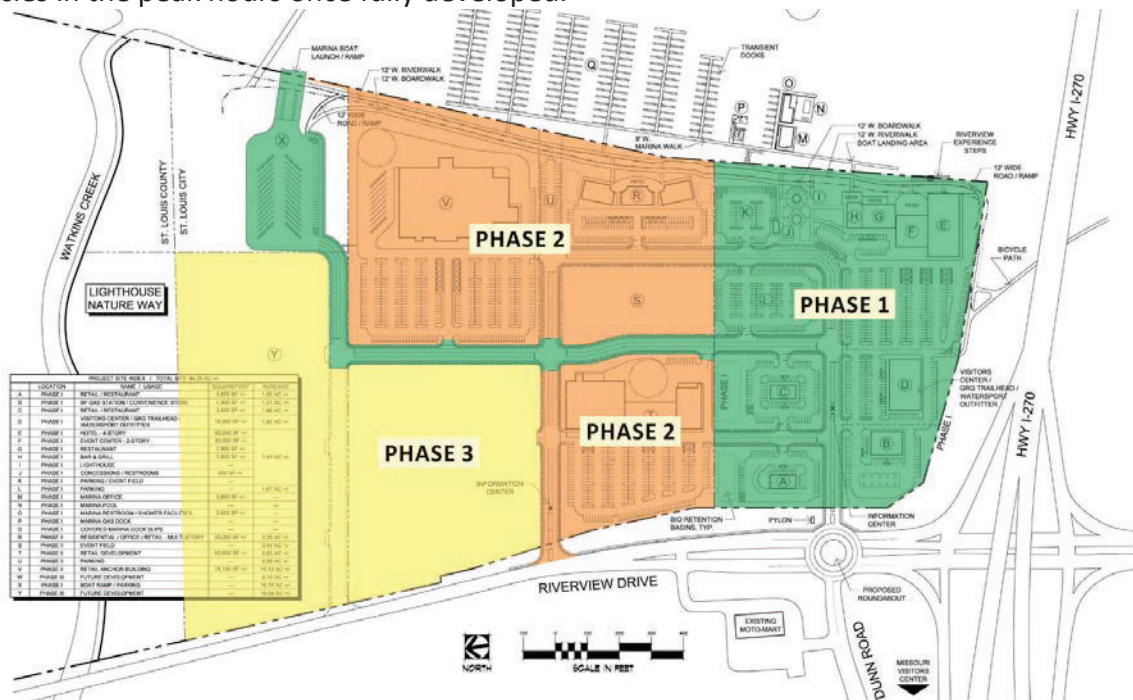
PIER DEVELOPMENT CONCEPT SITE PLAN (PROVIDED BY OTHERS)¹
